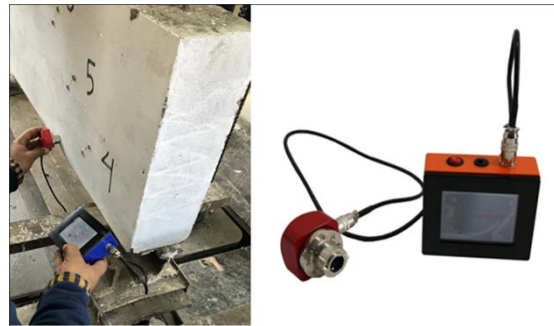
Digital Concrete Crack Width Gauge Tester.
